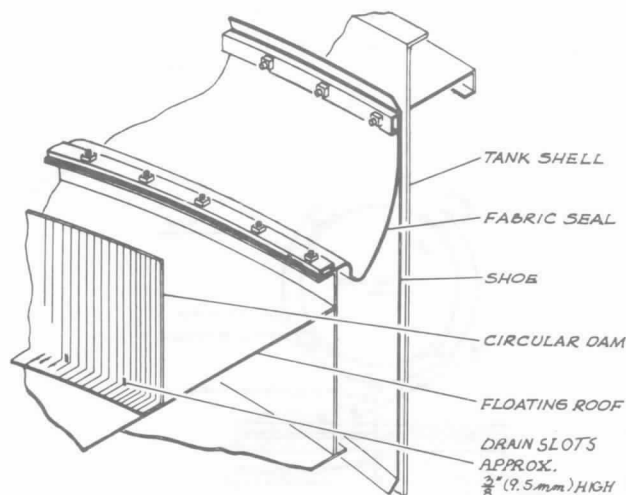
(f) Typical Foam Dam for Floating-Roof Tank Protection.
